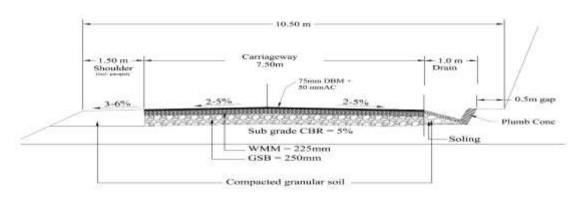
(1)- Design and Drawing aligned to Road Design Standard
